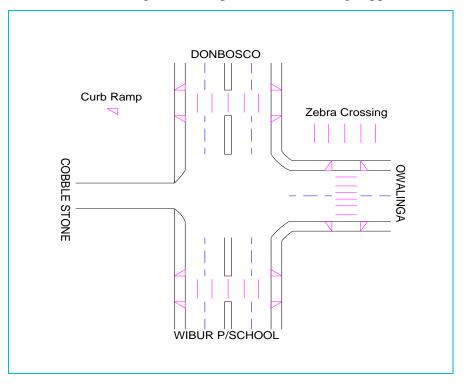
Suggested improvement layout of Baro Akobo intersection
